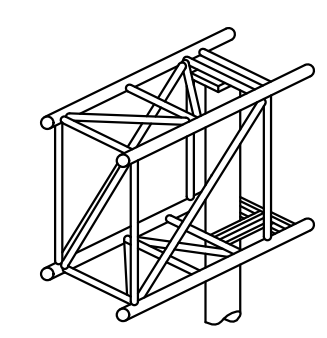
DETAIL OF TOP CHORD CONNECTION TO COLUMN
